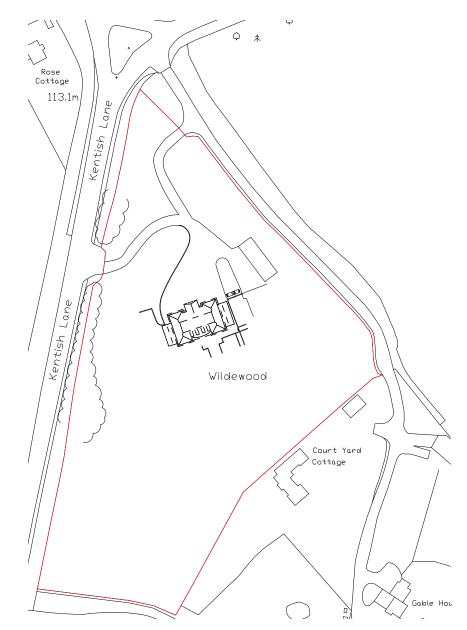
Site location plan, outlined in red. North to top (source: Architect)
